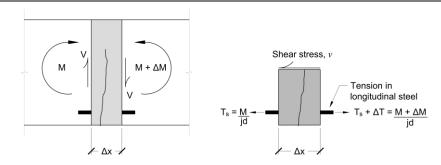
Derivation of shear stresses in a cracked concrete member
